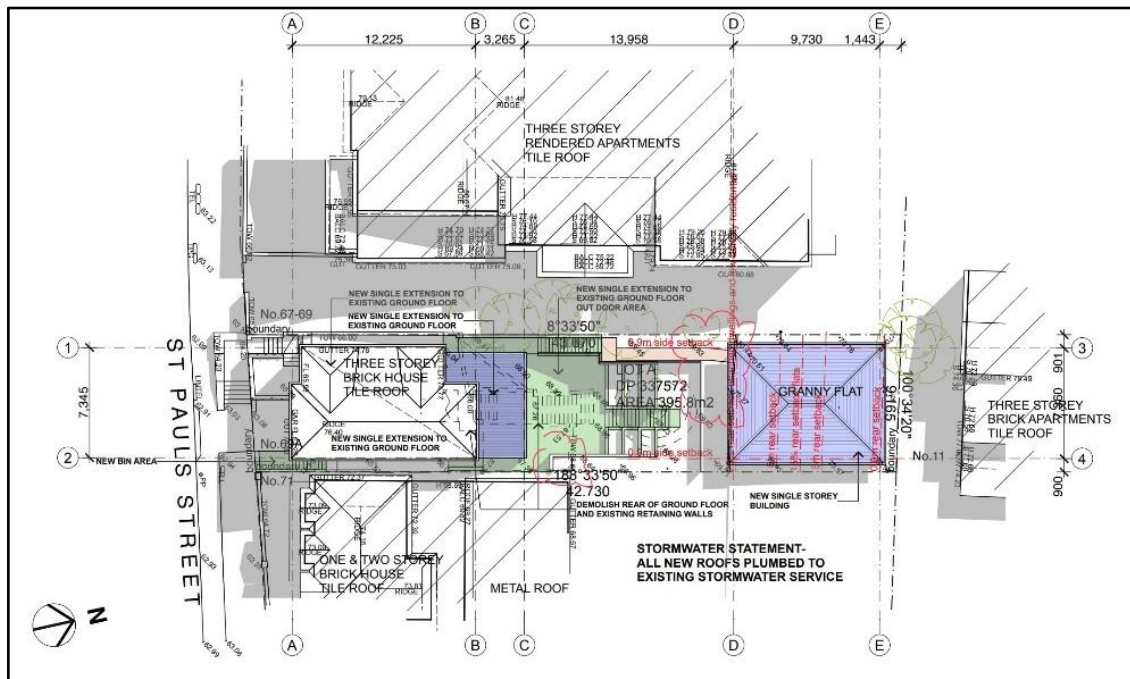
Site and Roof Plan (Rev B), 2/11/2023 (Fortey & Grant Architecture)
